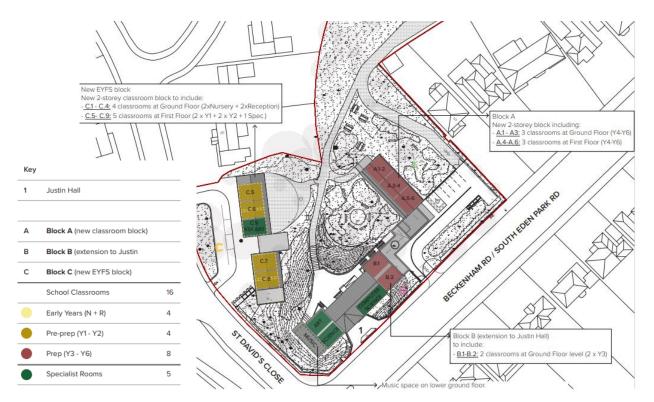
Proposed Masterplan Phase 2 (subject to subsequent planning application)
